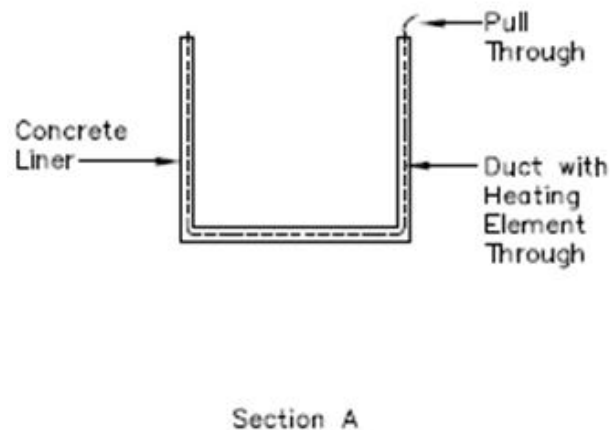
End view of concrete liner showing embedded conduits for heating elements (Courtesy Arup)
